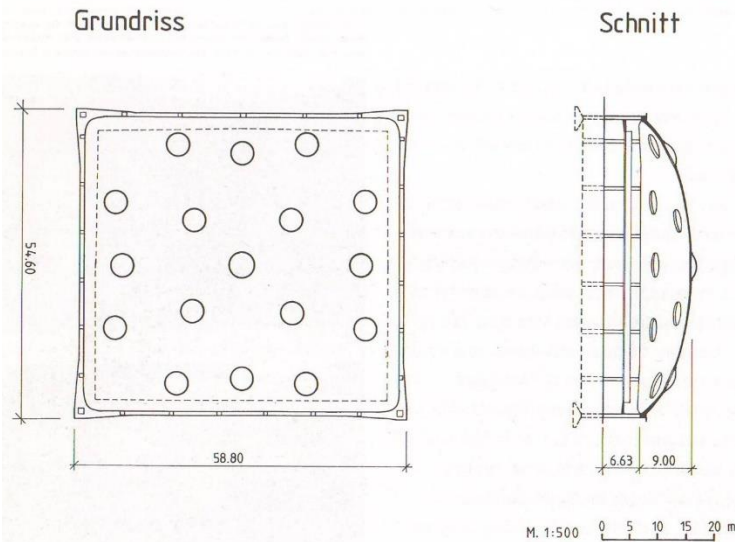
Plan and section of COOP Warehouse (Chilton, 2011)
